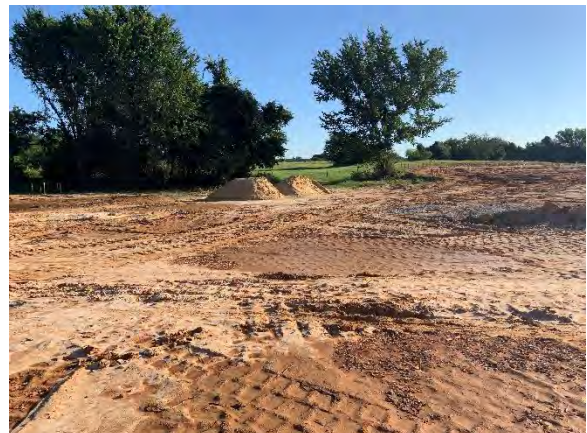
Earth fill and pad preparation remaining to be completed at Building 1 Clubhouse.
